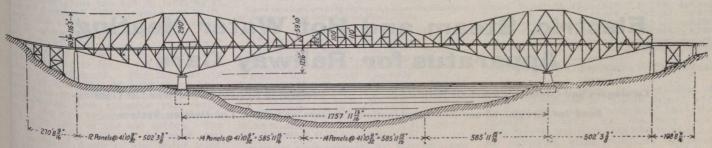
Unaccepted design C-Y of St. Lawrence Bridge Co. for Quebec bridge.
